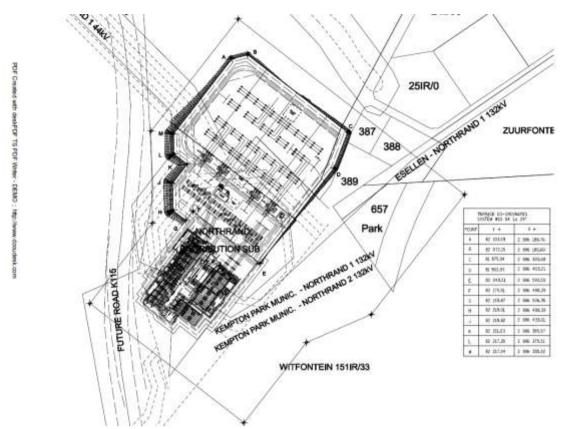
Layout plan of Northrand Substation (Courtesy ESKOM).
